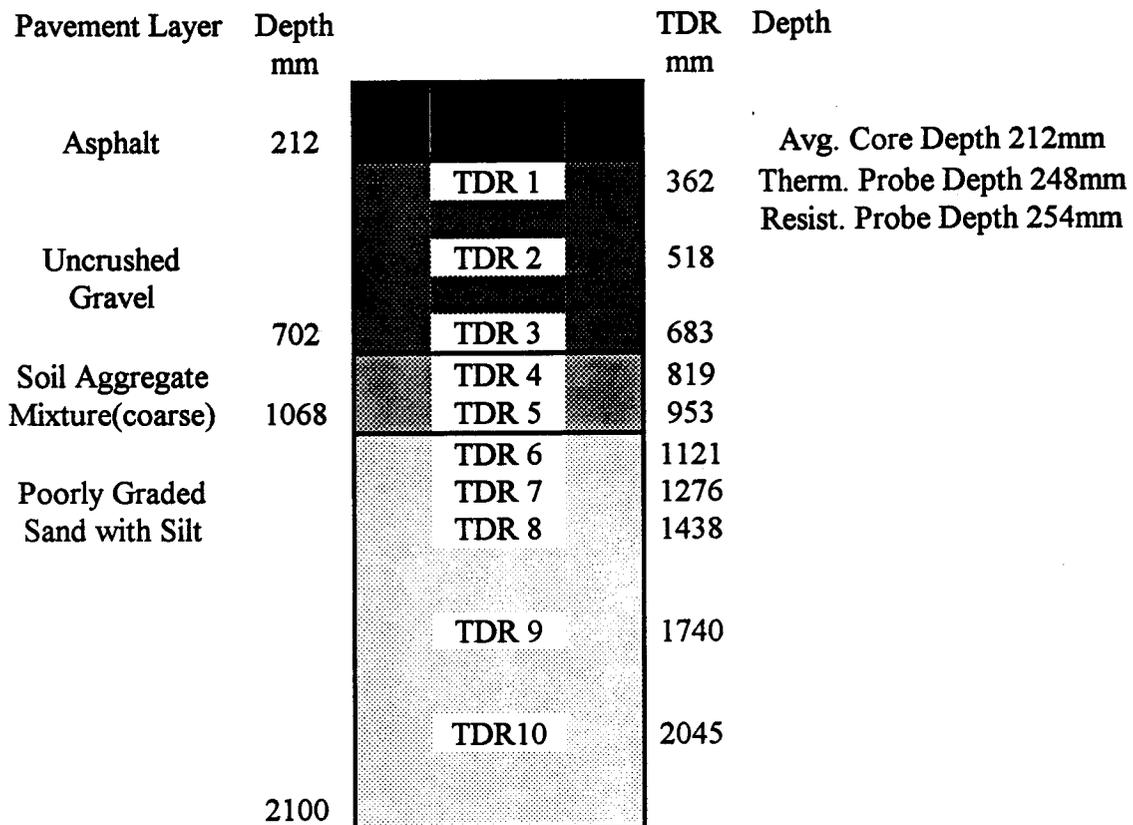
Profile of Pavement Structure and Probe Depths from Surface, Station 0-16
